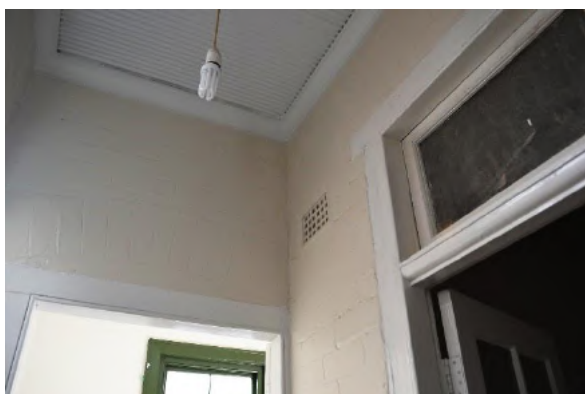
Original brick arched head above doorway opening to rear bedroom (space 1.6)—50A / 48–56 Gloucester Street, showing original wall vent, door frames without architraves, brick walls and ripple iron ceiling. (Source: GML Heritage, July 2016)
